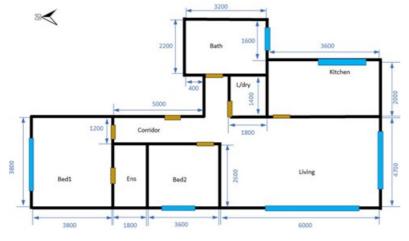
Floor plan of the Apartment building (Isaacs 2007, p.17)
